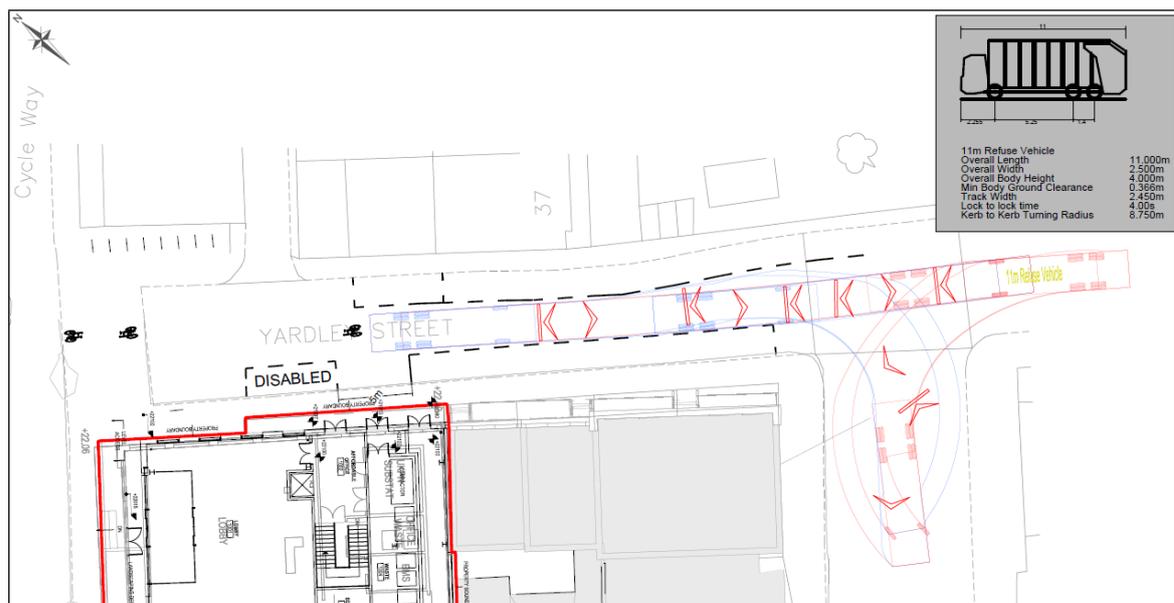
Swept paths for proposed refuse collection vehicles servicing the site
